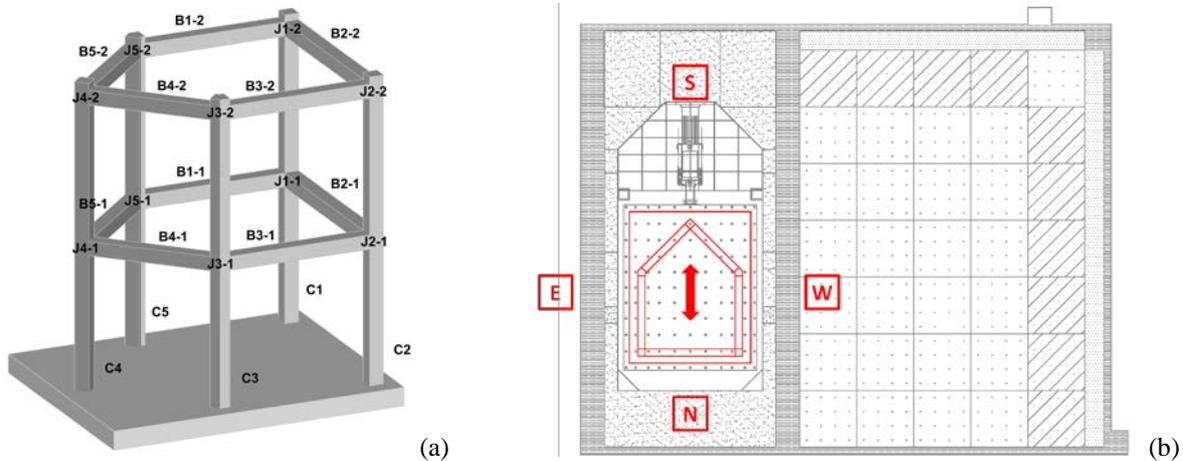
(a) 3D-sketched of the RC structure, with identification of beams (B), columns (C) and joints (J); (b) Plan view of the EUCENTRE laboratory and position of the shake-table and of the model building.
